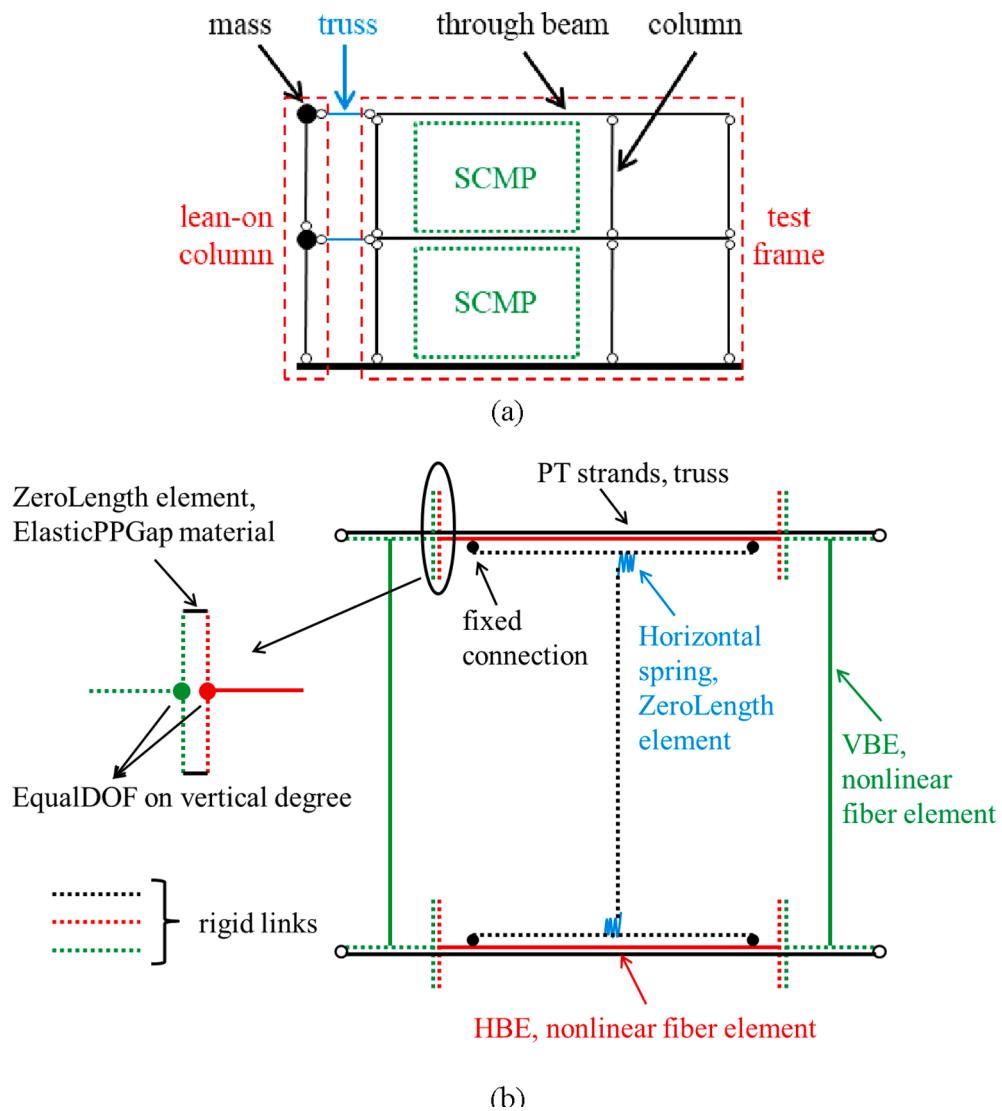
Schematics of FE model (not to scale): (a) test structure; (b) SCMP modeling details.
